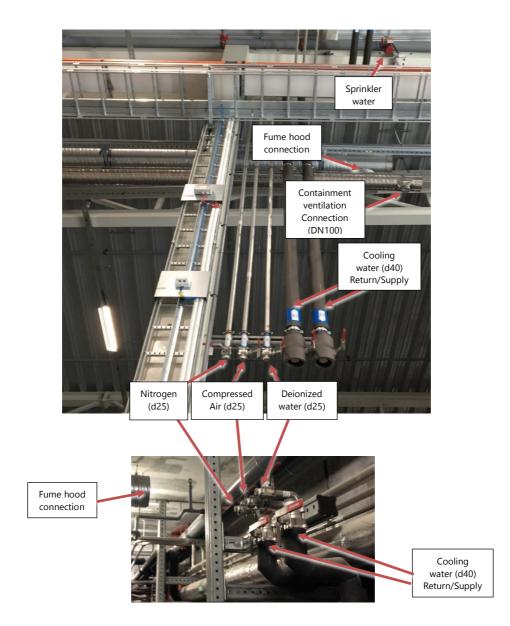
CF utilities in the E buildings (top) and in the installation galleries under the D buildings (bottom)
